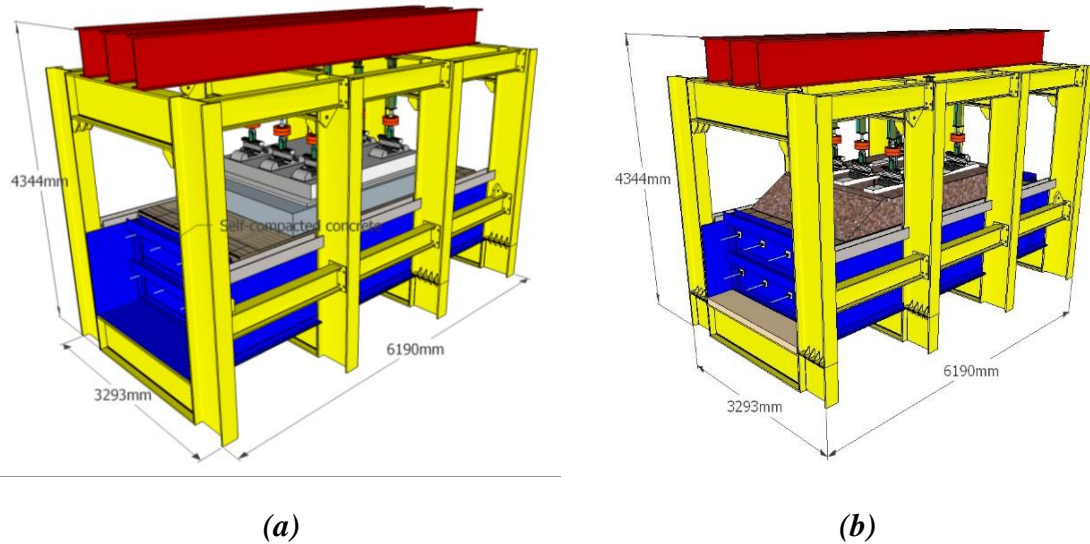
Geopavement and Railways Accelerated Testing Facility (GRAFT-2) at Heriot-Watt University, (a) slab track and (b) ballasted track resting on GRS-RW structure
